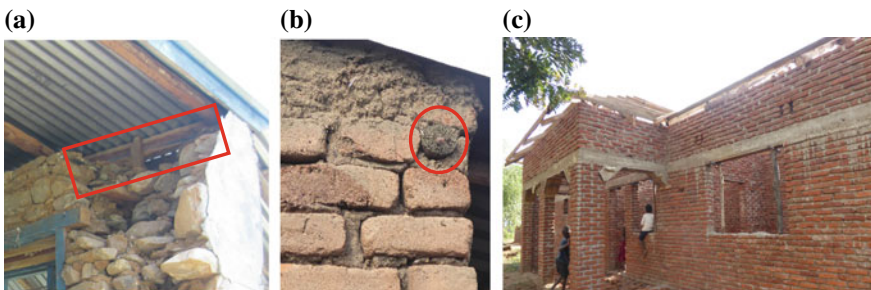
a Timber wall plate of rectangular section, b timber wall plate of circular section, and c concrete ring beam
